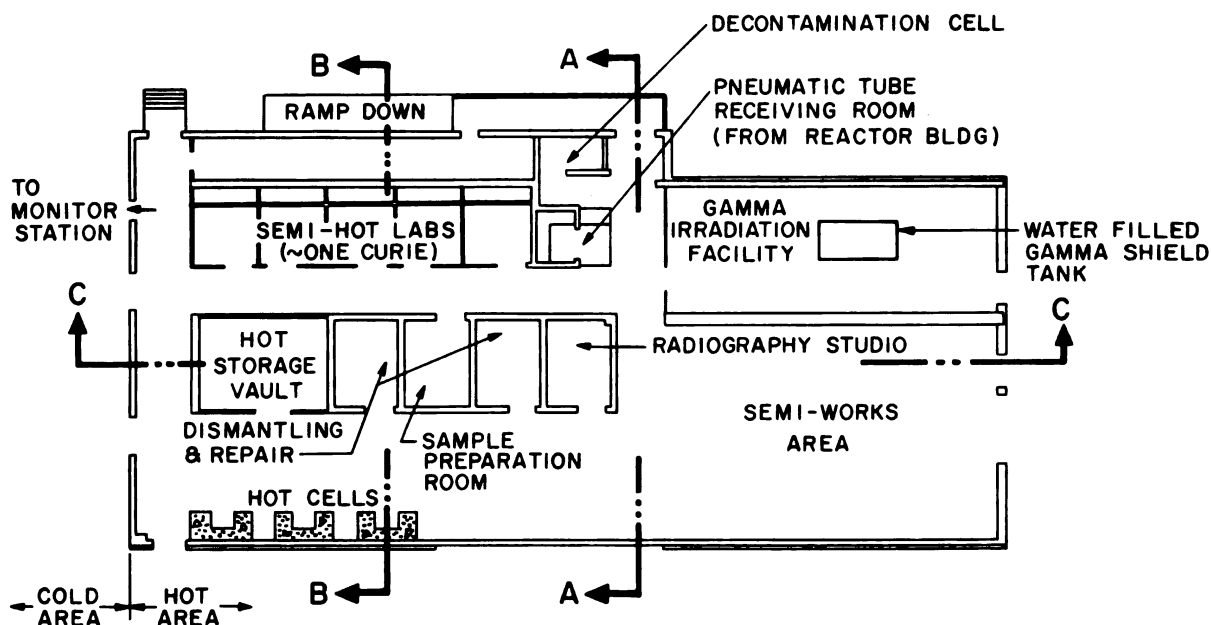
Main-floor plan of the hot area. This section of the main floor contains the heavy shielding and is built directly on the ground. Sectional views AA, BB, and CC are shown in Figs. 4 and 5.
